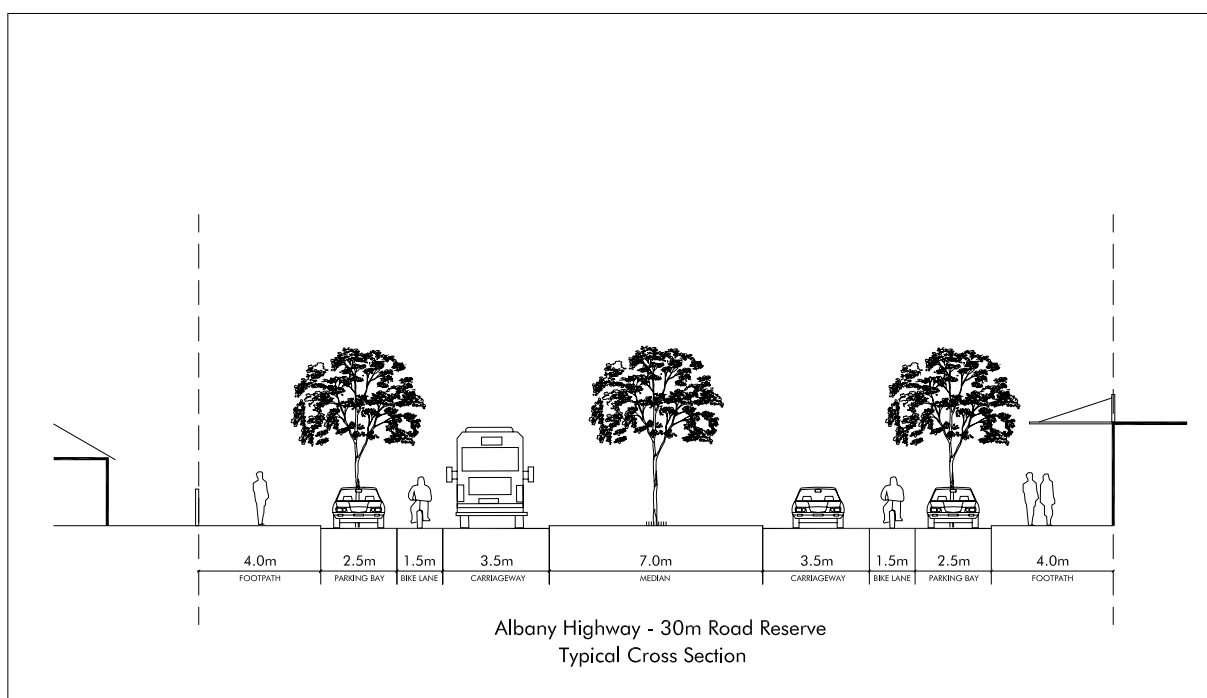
Typical Cross-section of Albany Highway Between the York Street Roundabout and Sanford Road.
